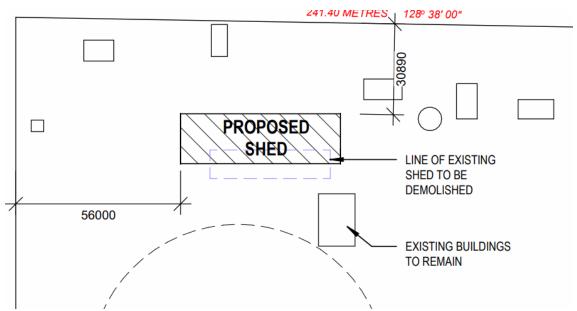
Part site plan showing existing building footprint overlaid with proposed building footprint, and cluster of heritage buildings.
